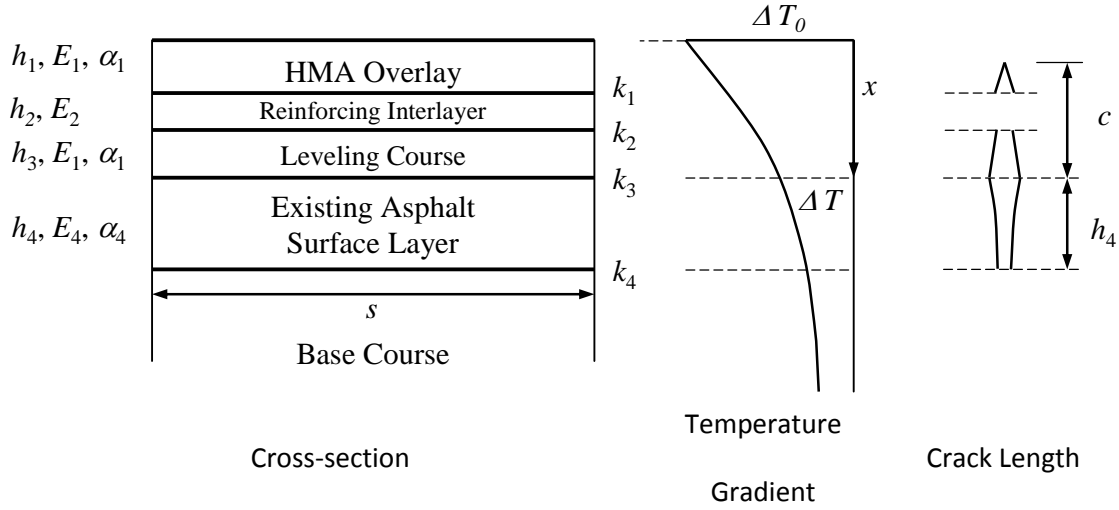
Diagram of HMA overlay on asphalt concrete pavement with reinforcing interlayer beneath overlay-thermal.
